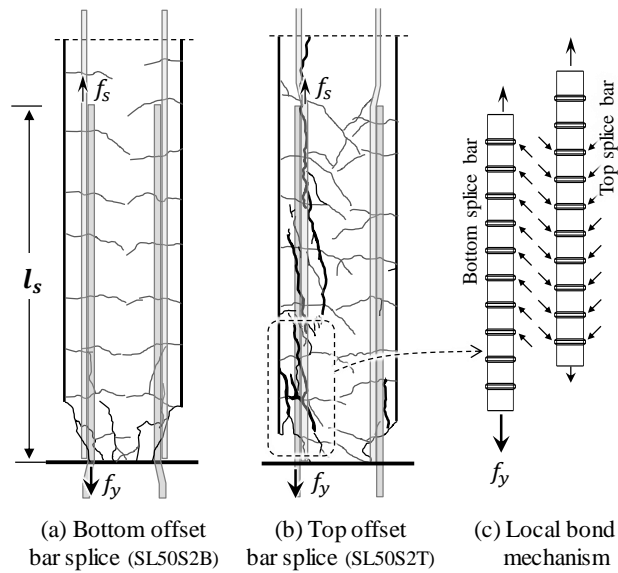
Failure mode and stress transfer between spliced bars via surrounding concrete
